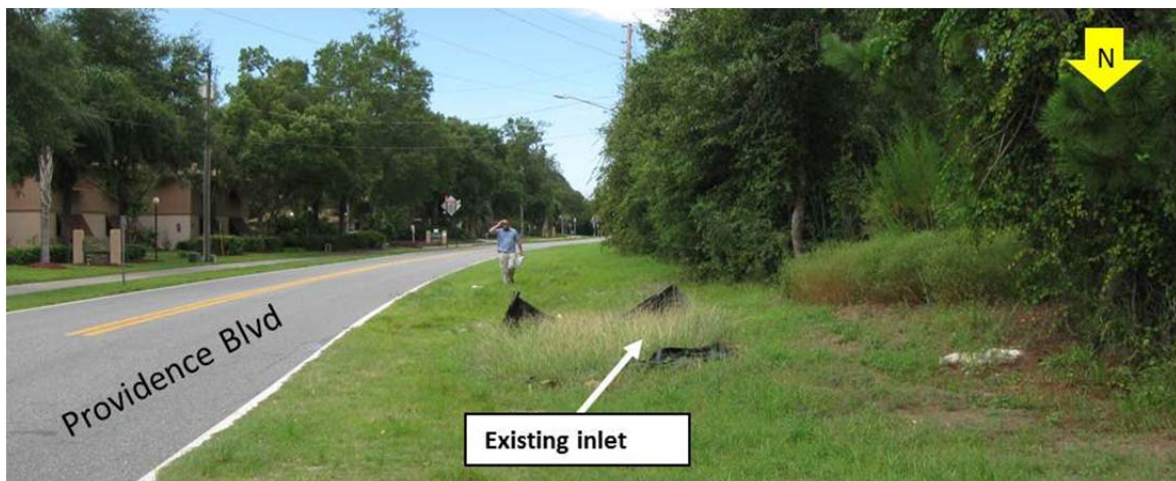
Inlets adjacent to Providence Boulevard will need to be designed around or modified.
